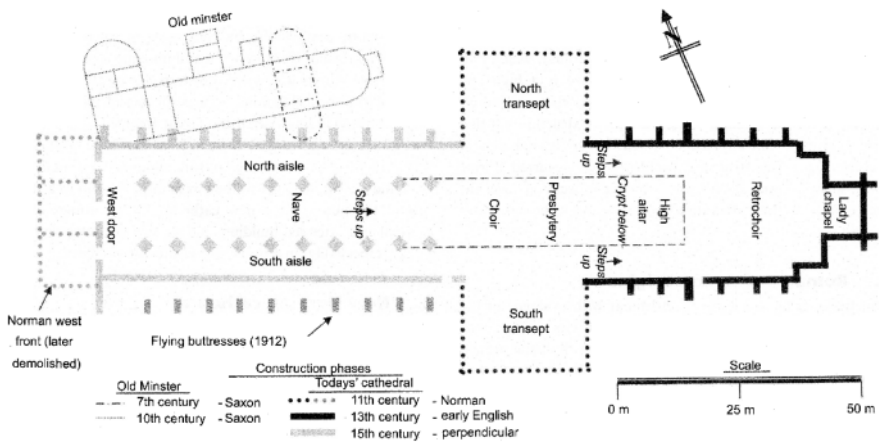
Plan of Winchester Cathedral (Roberts 2013).
